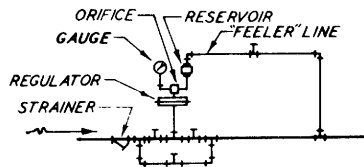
Typical installation of a Pressure Regulator. Showing feeler pipe connection and pressure gauge. Feeler pipe is connected to reduced pressure side of supply line and at point where control is desired.
